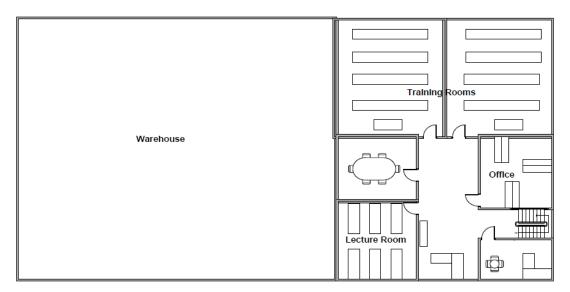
Mezzanine Floor of the Old Building (Source: IBLF/CRTAD PMU PROJECT HANDOVER, 2010)
